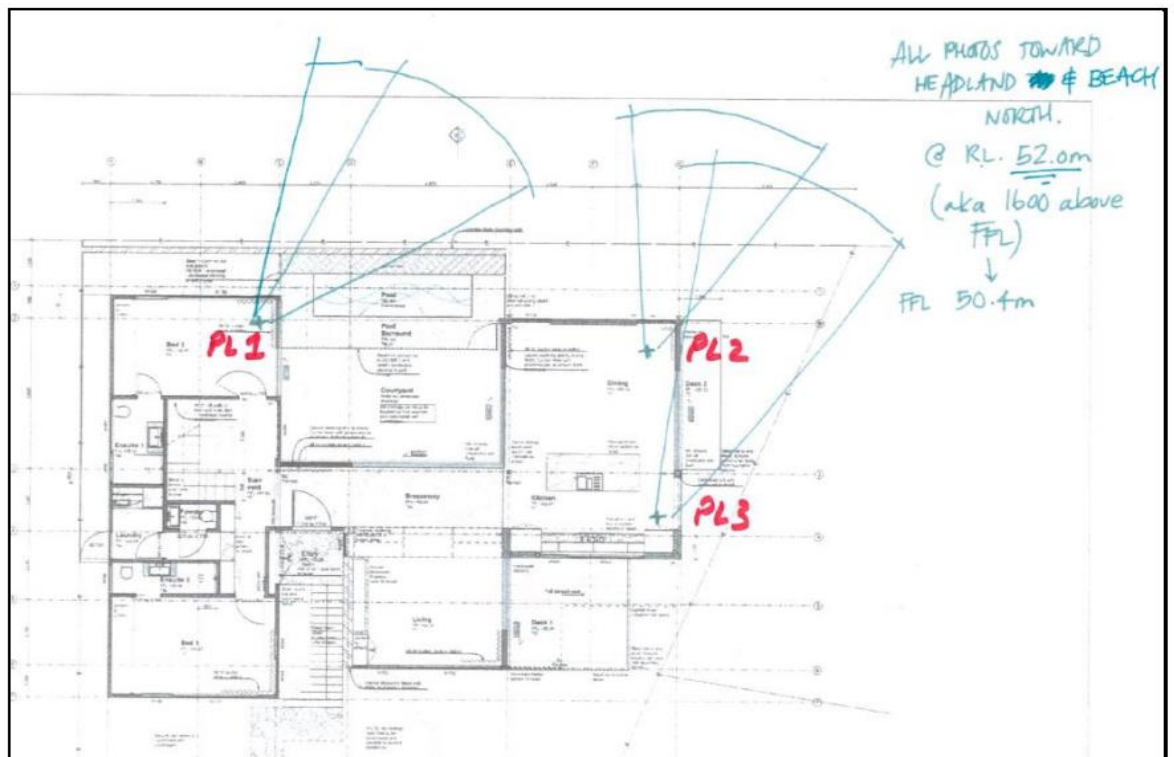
Diagram showing positions and RL's for photographs taken from future ground level of dwelling house under construction (Courtesy Poppy Bevan Architect).
